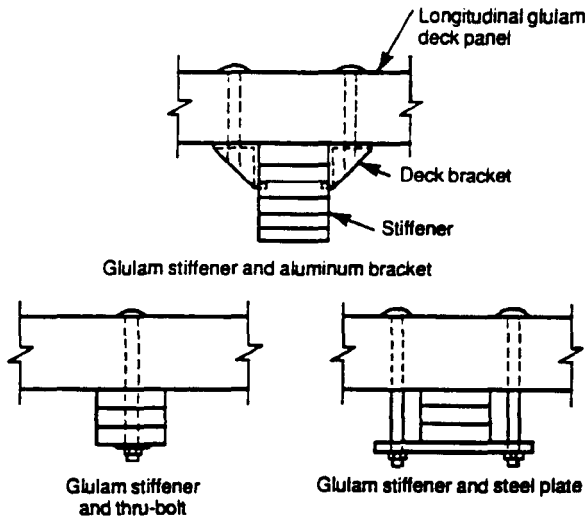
Attachment Techniques for Spreader Beams to Longitudinal Decks
